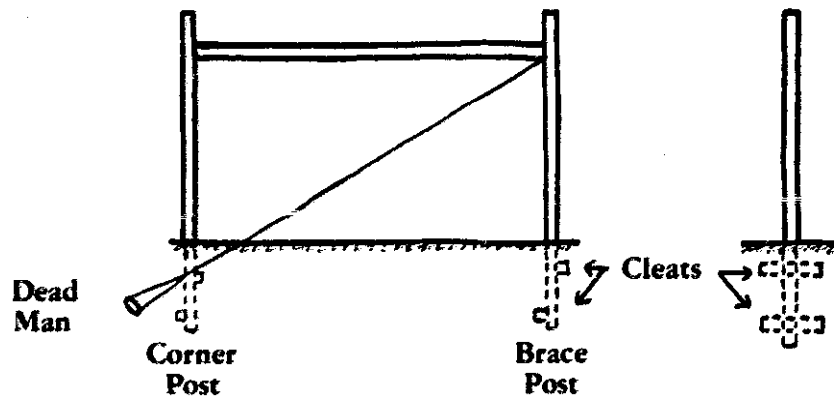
Bracing a corner post with a strut, a dead man, and cleats on the brace and corner posts.
